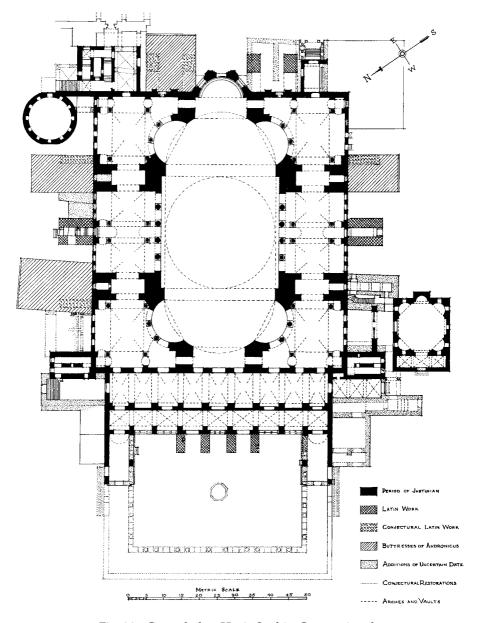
Ground plan, Hagia Sophia, Constantinople
